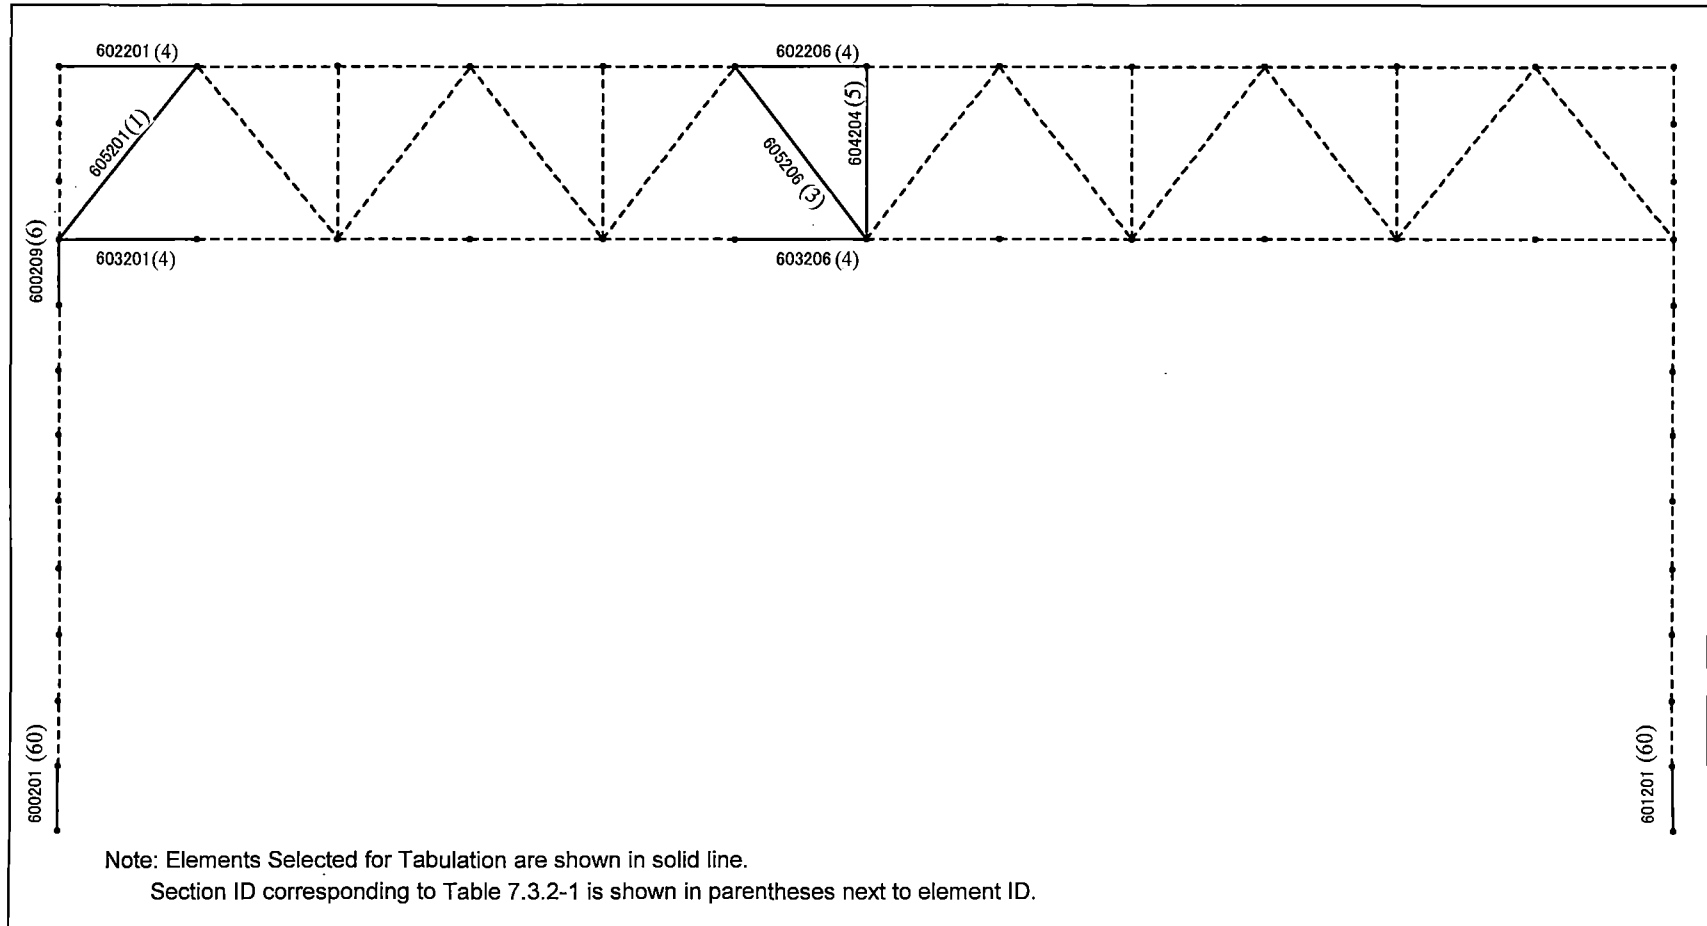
Elements Selected for Tabulation - RB Roof Truss and Supporting Column on R4 Column Line
